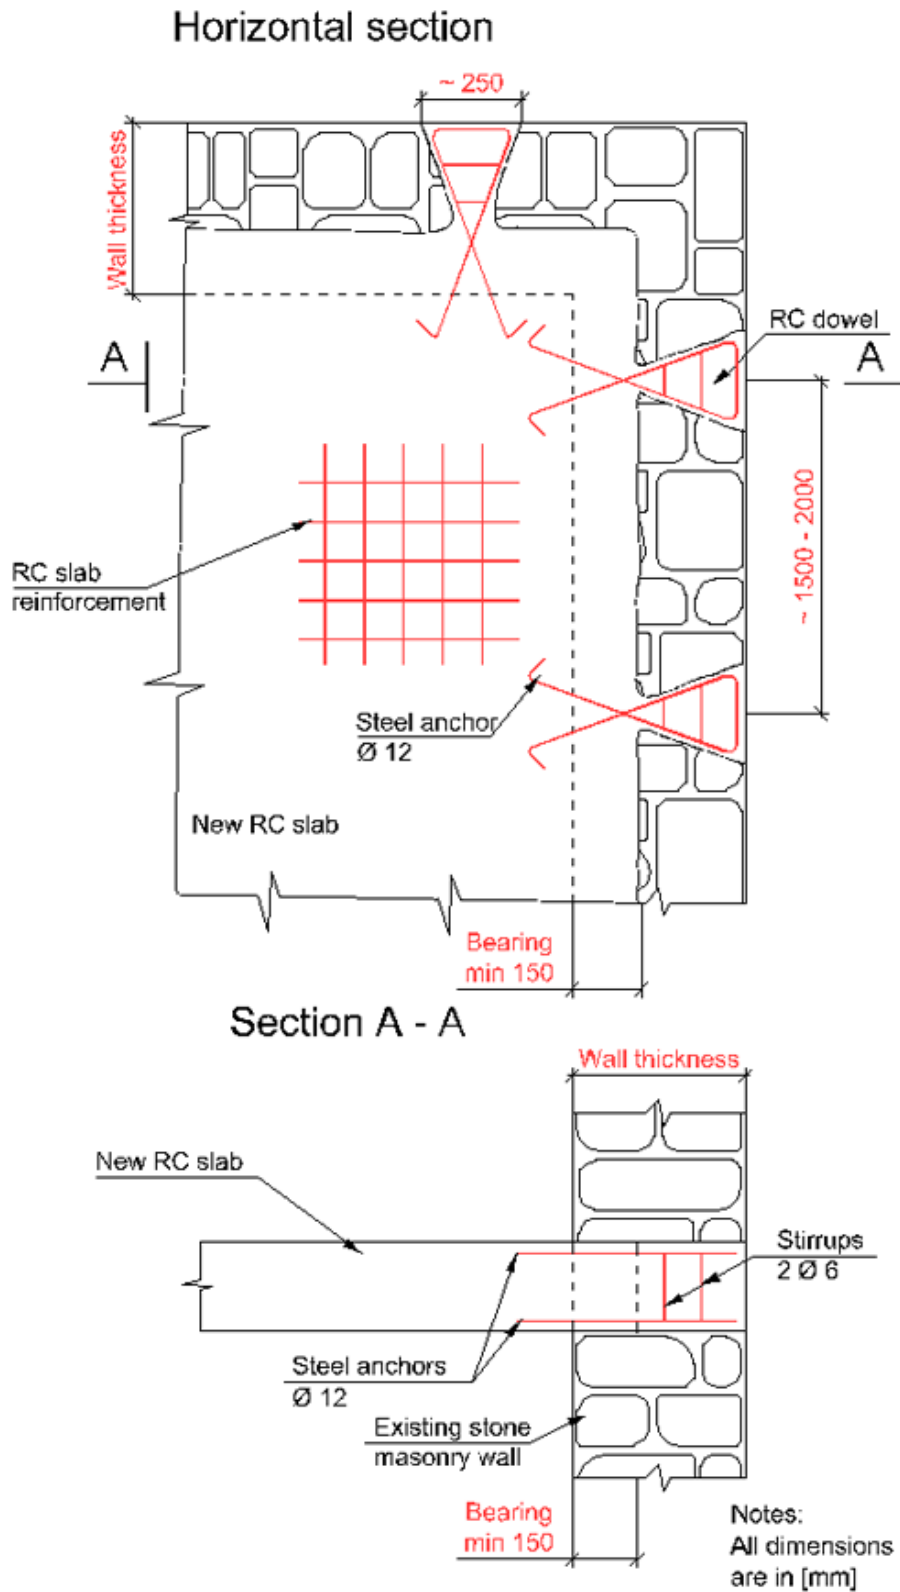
New RC slab cast in situ and its anchoring into stone masonry walls [45]
